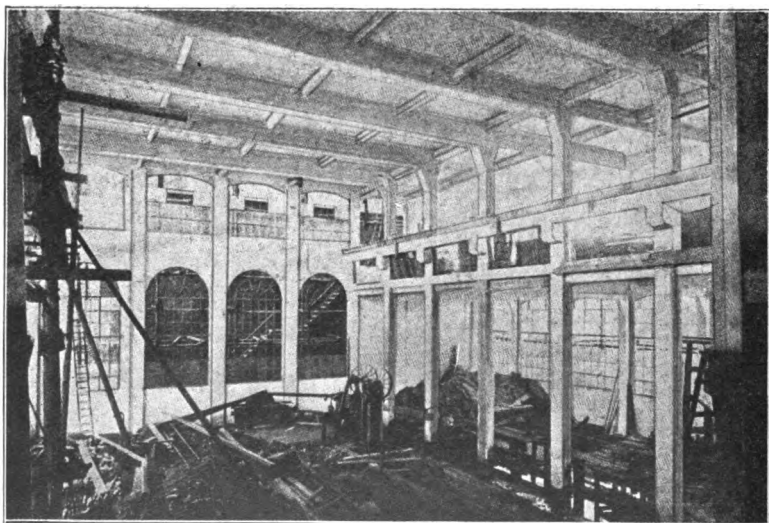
All-concrete Foundry, Hull, England. Unusually well lighted. Span of girders, 40 feet.
